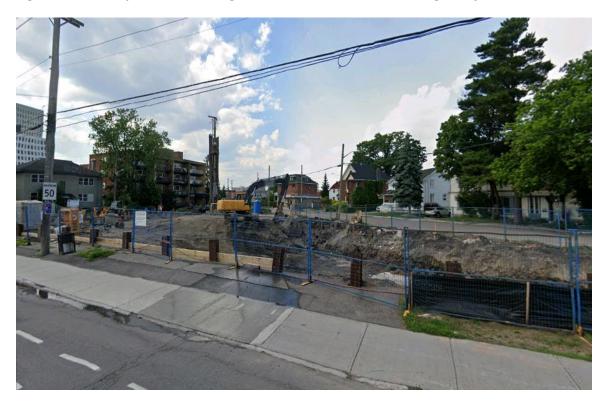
Residential on south east corner of Vanier Parkway/McArthur Avenue
